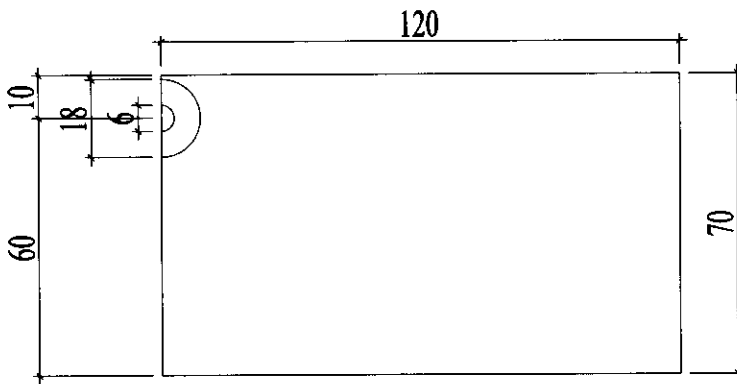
Cross-section of tunnel model at 10m depth (unit: m).
